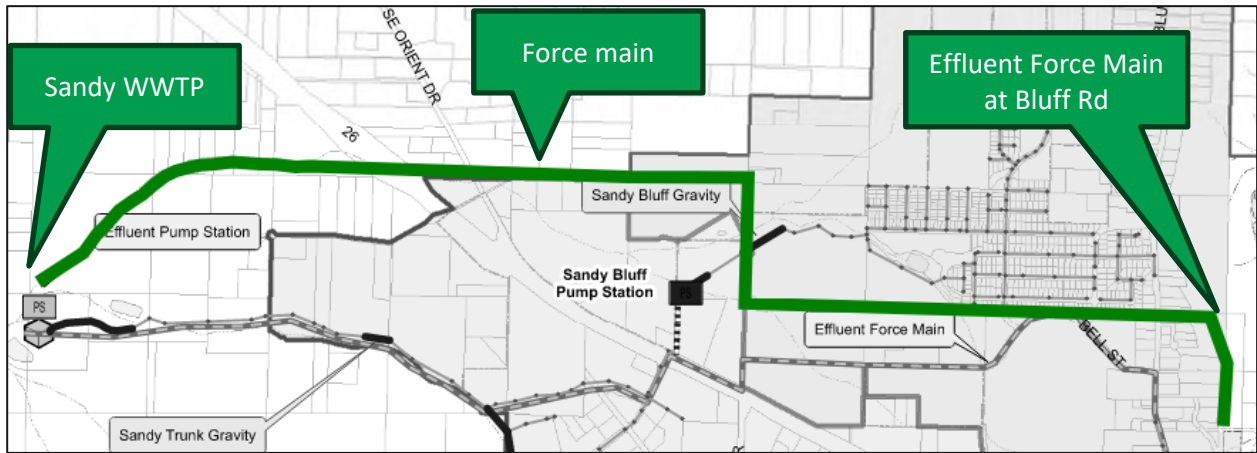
Planning Level Force Main Alignment to Bluff Rd.
